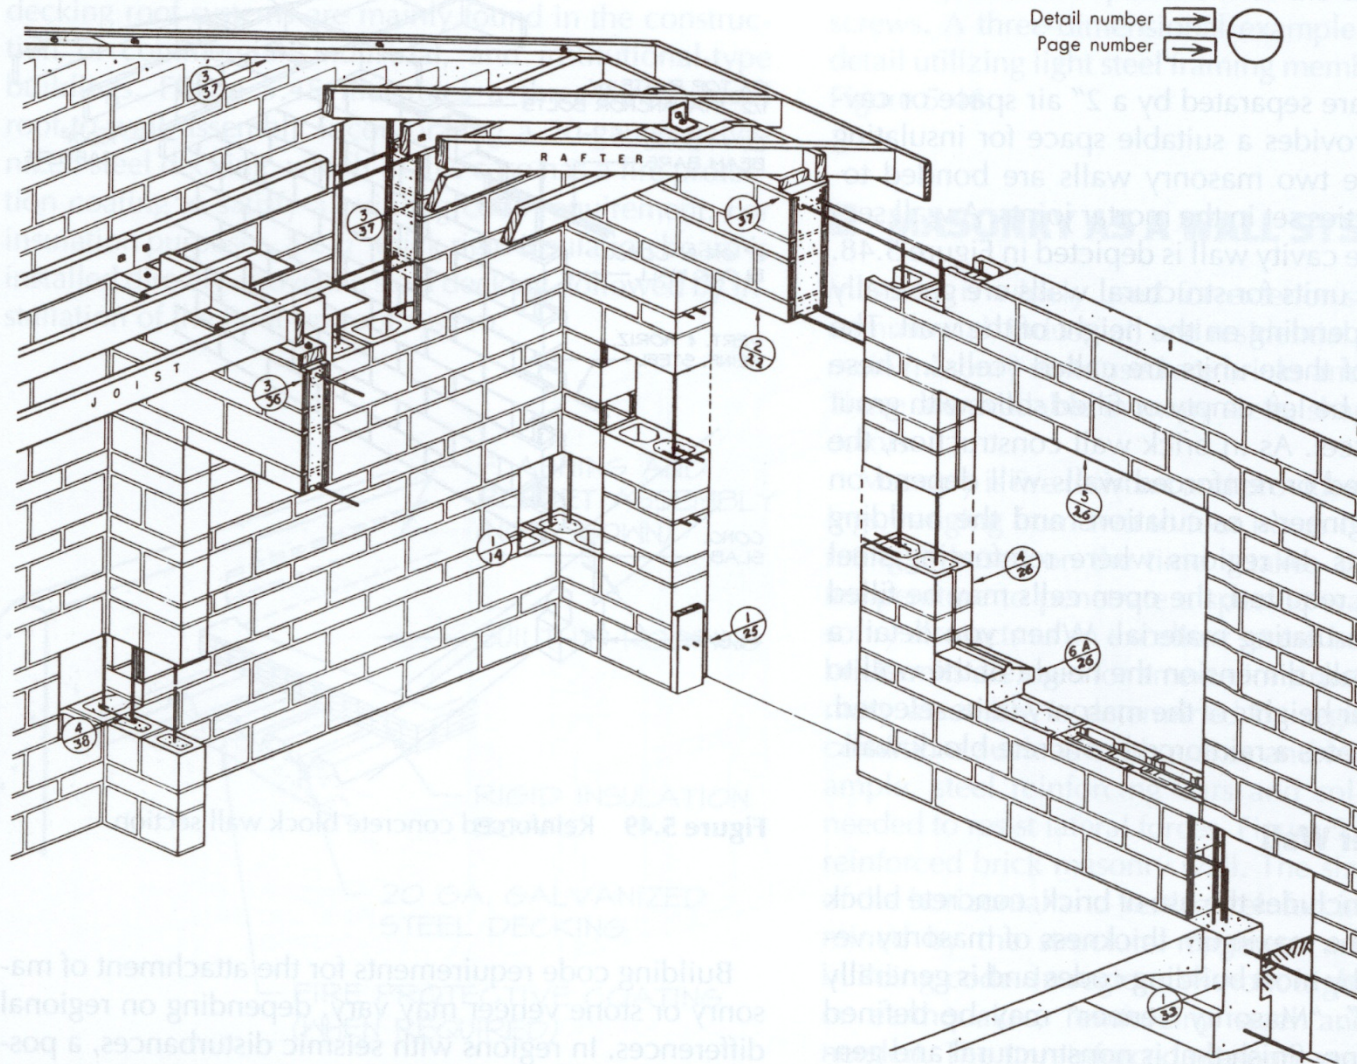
Typical concrete block residential construction. (Reprinted by permission from *Professional Practice of Architectural Detailing*, 3d Ed., © 1999 by John Wiley & Sons, Inc.)
